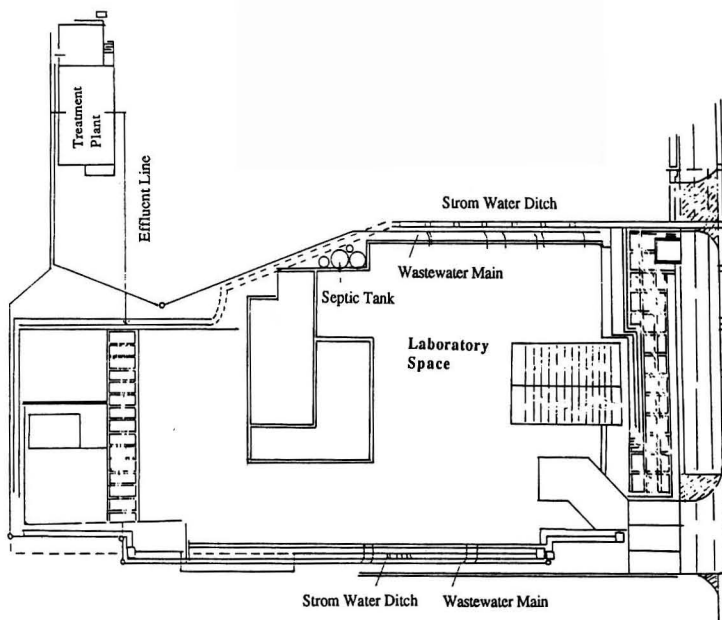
The Plan of DCB Laboratory Building and Layout of Wastewater Collection and Discharge Lines
